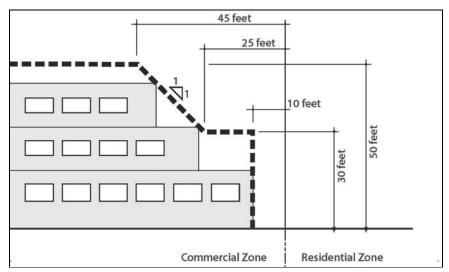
Building Height need to amend showing min. of 35' and max. of 45'
